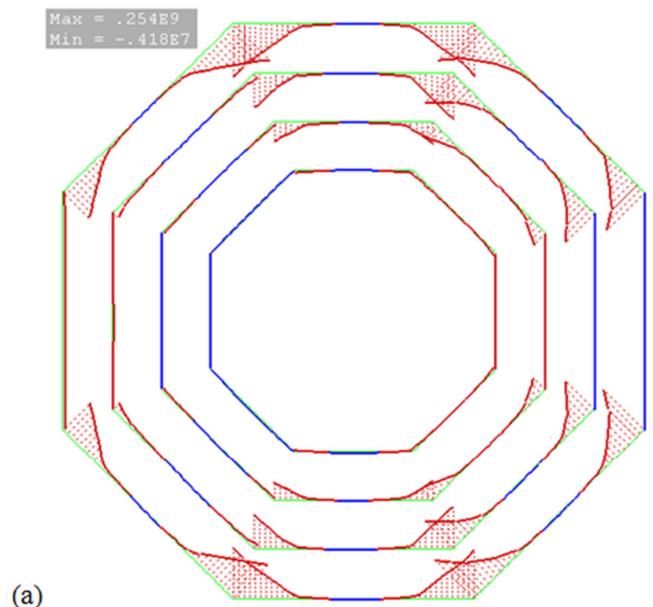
Spire in plan showing damage for wind analysis at collapse (locations in blue with stresses (MPa) higher than masonry tensile strength).
